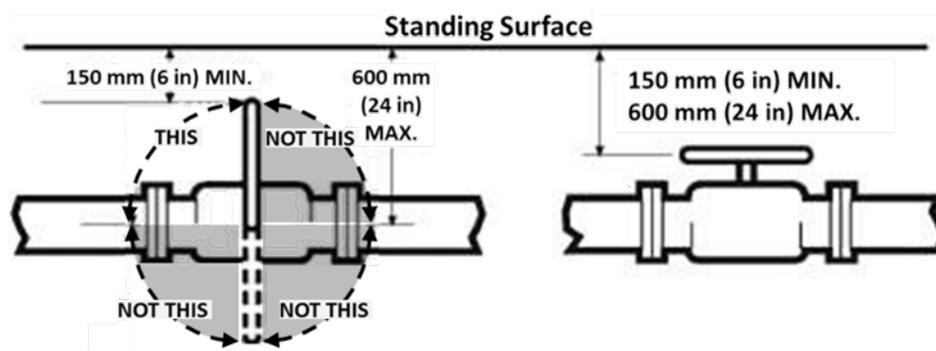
Mounting position for valve levers and handwheels below standing surface.
